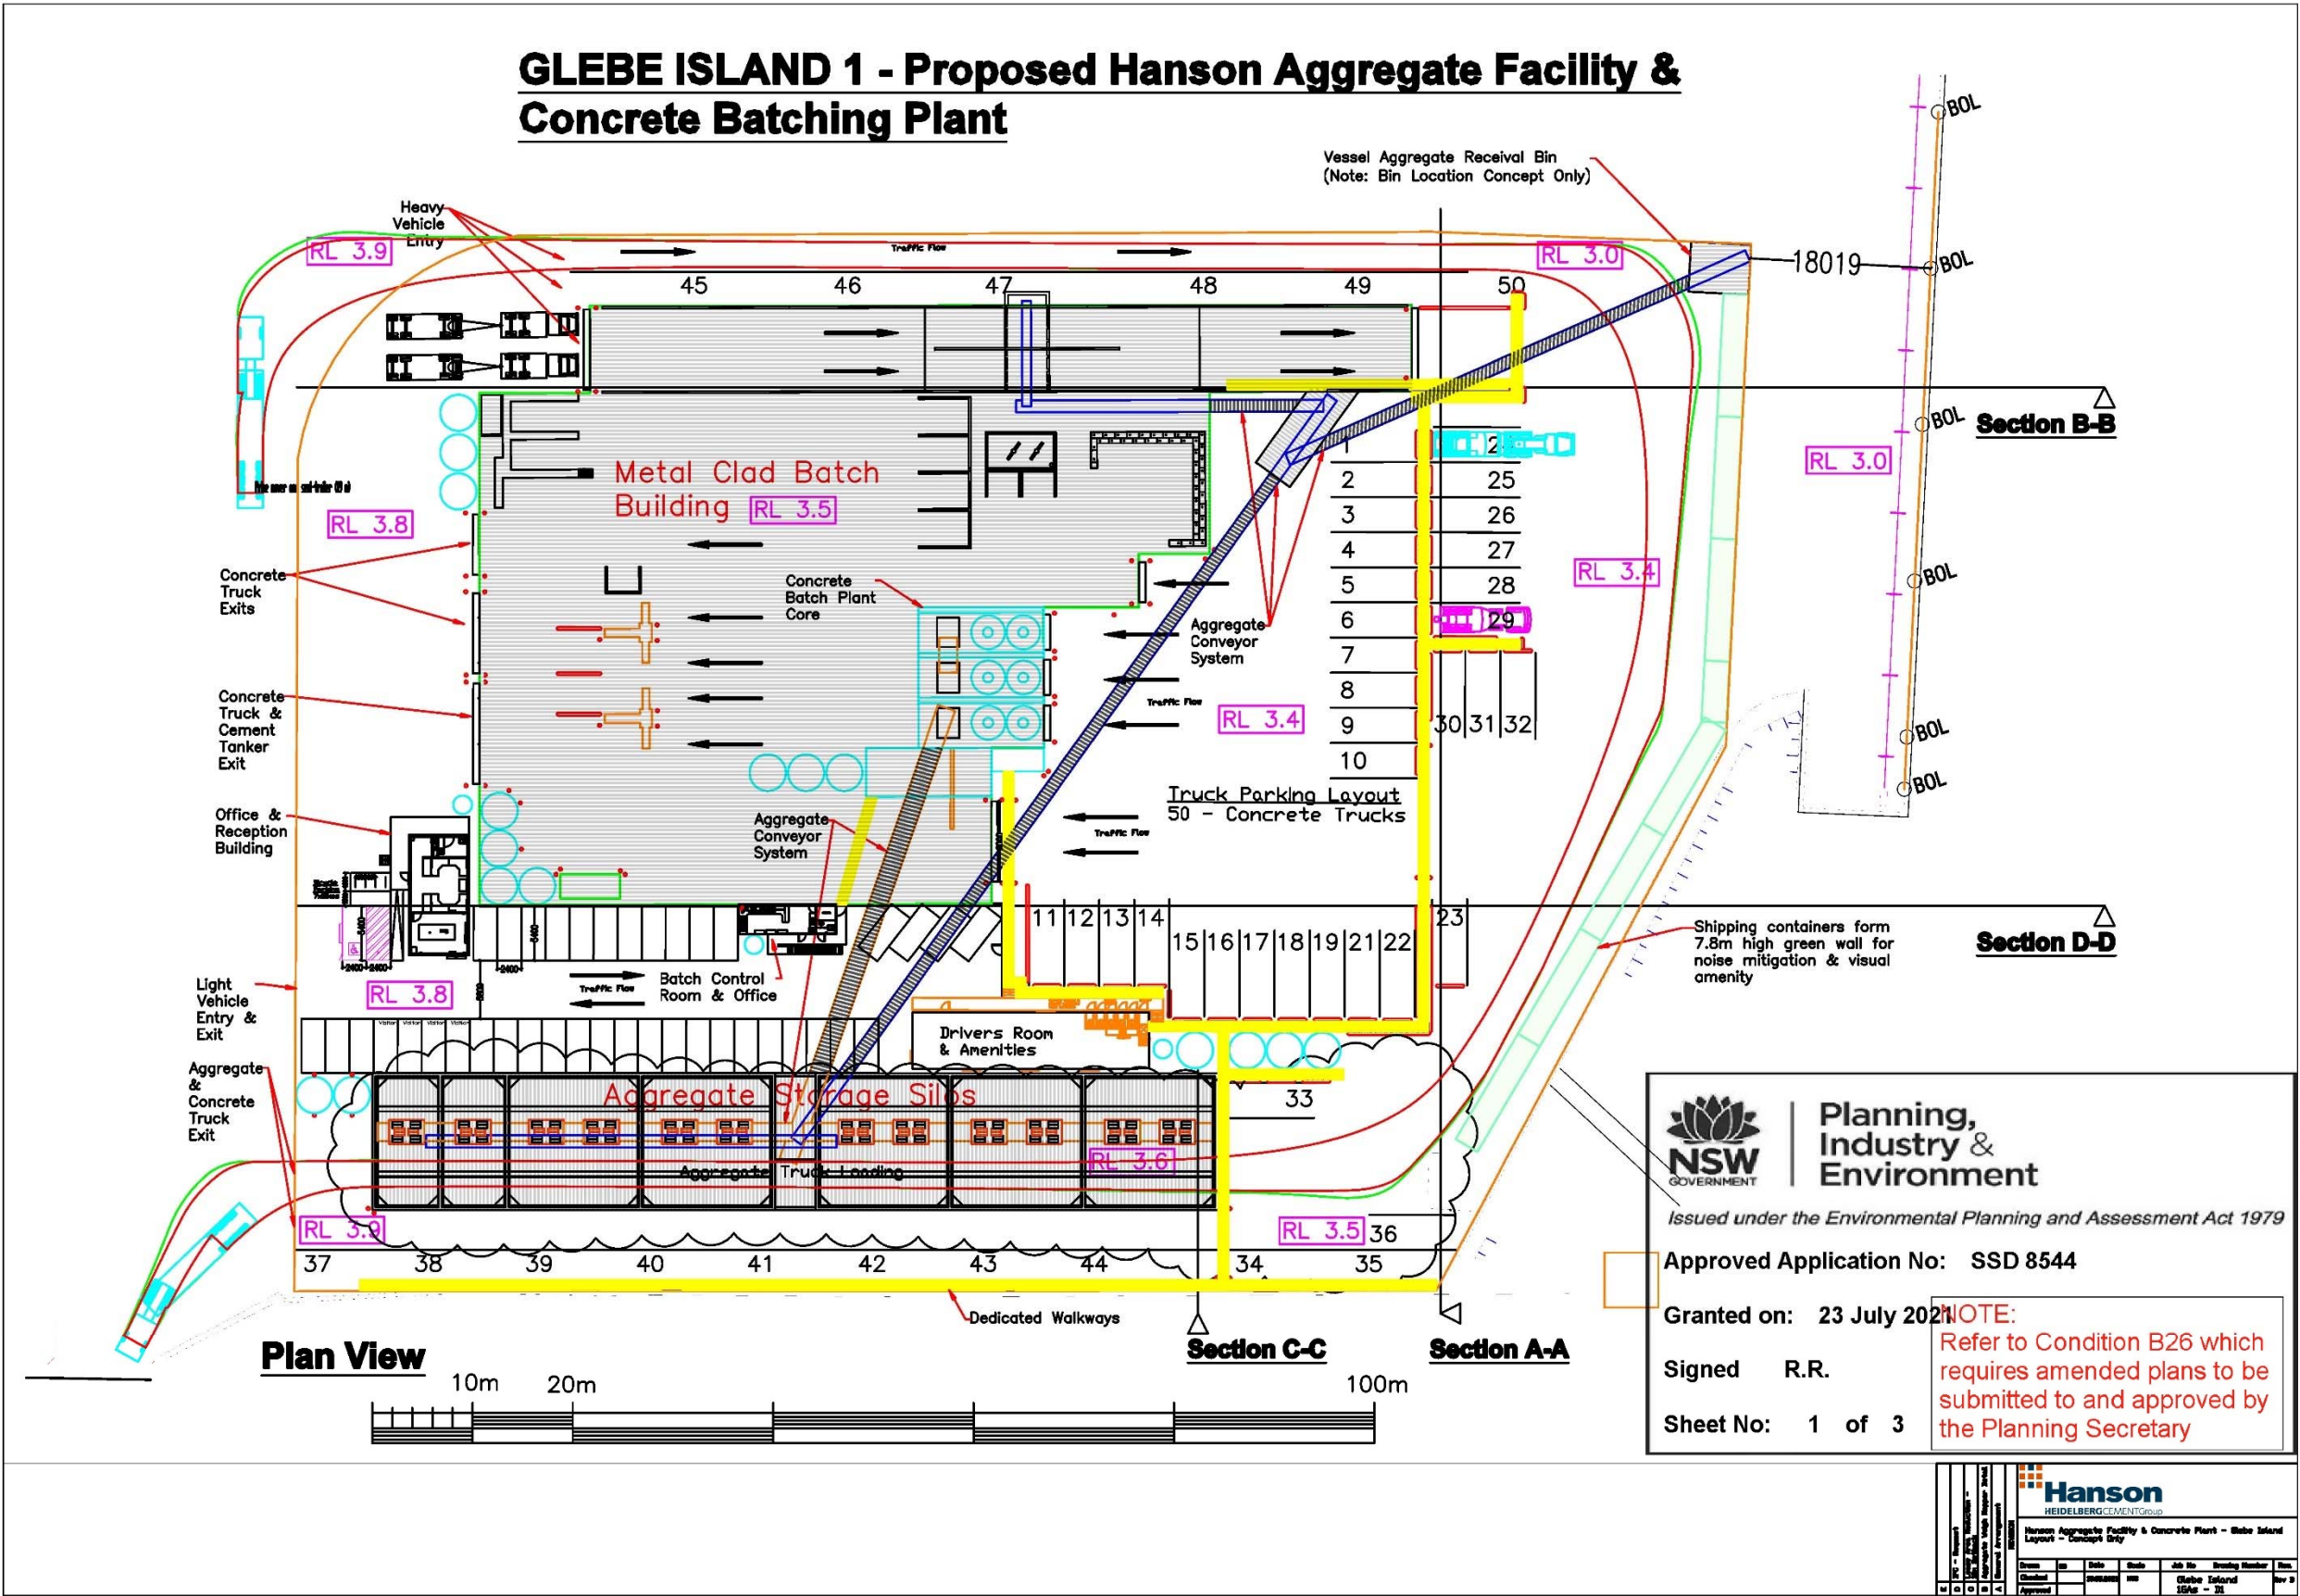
Stamped Plans of the concept layout of the Glebe Island Concrete Batching Plant
